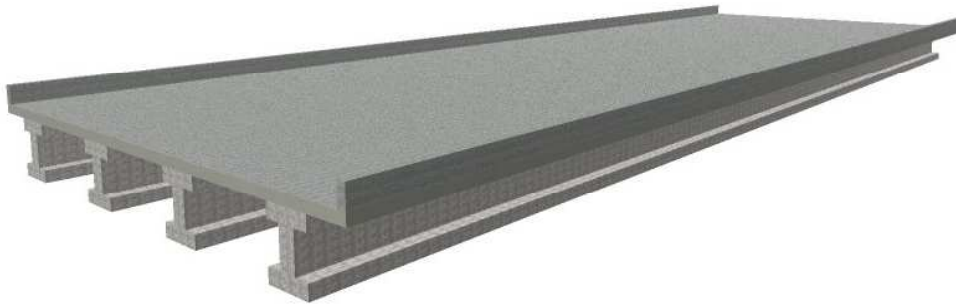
Reinforced Concrete Composite Bridge Deck with Pre-stressed Girders (Illustrative Scheme).
